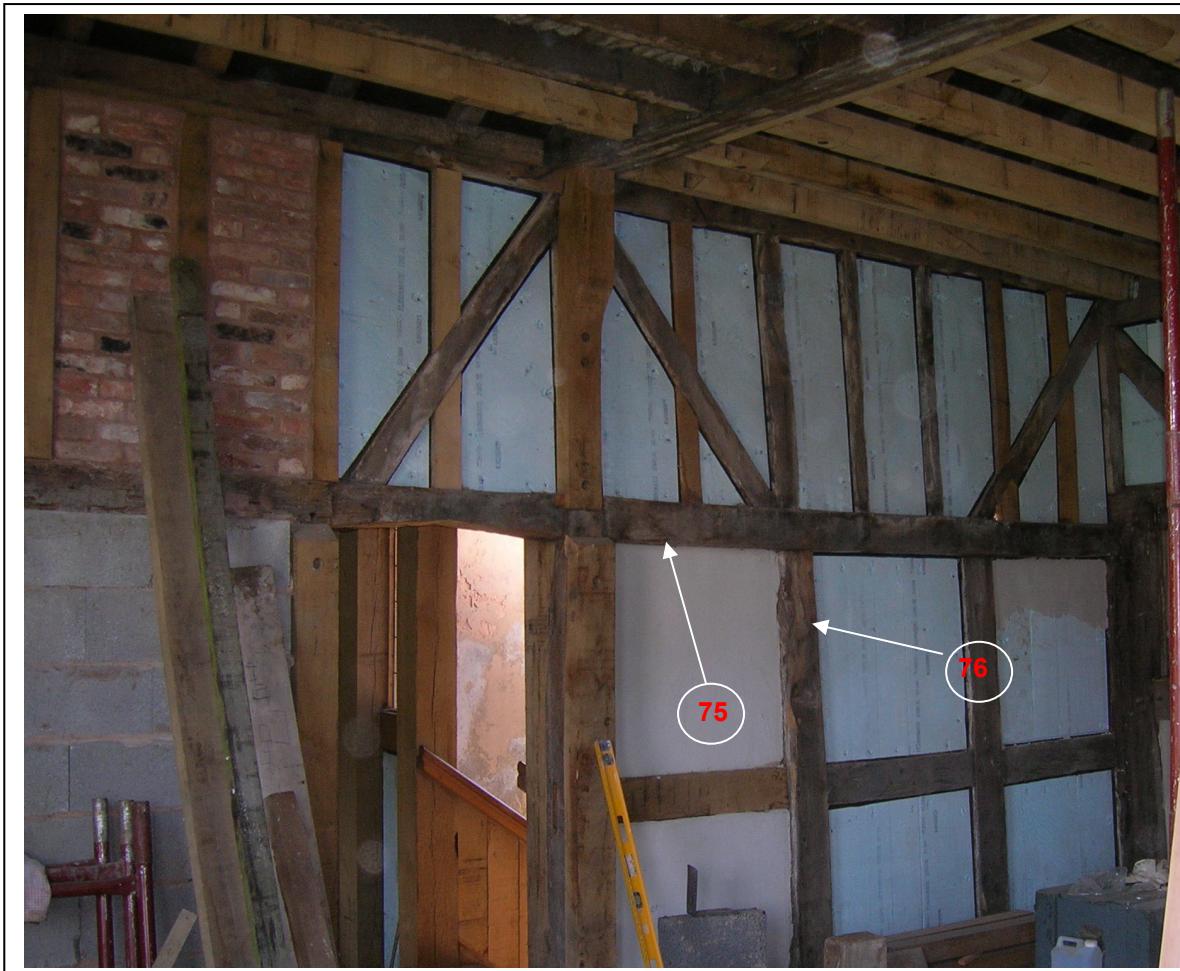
'de Freville building', south wall, north (internal) face to show sampled timbers
